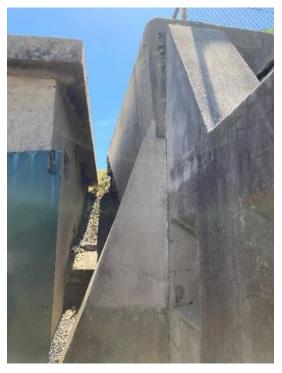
View of the Searchlight Generator Room and dry ditch wall, looking southeast. (Source: CPH, 2023)
